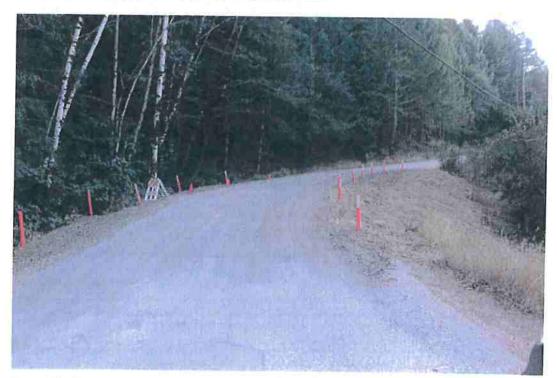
Mile 12.6: Recent culver repair, short gravel segment. 18-ft road width with 2-ft shoulders.
